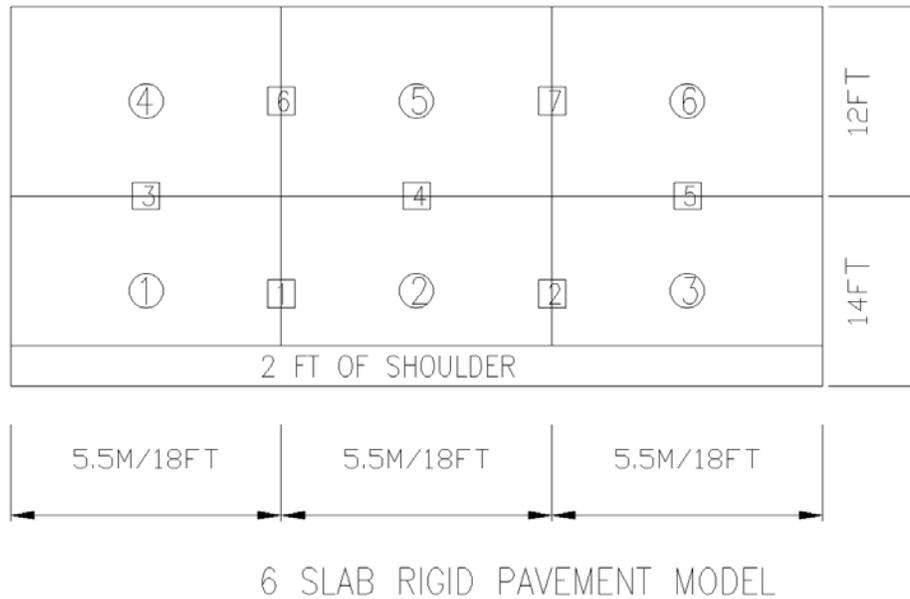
Six-slab Model for Rigid Pavement Analysis
